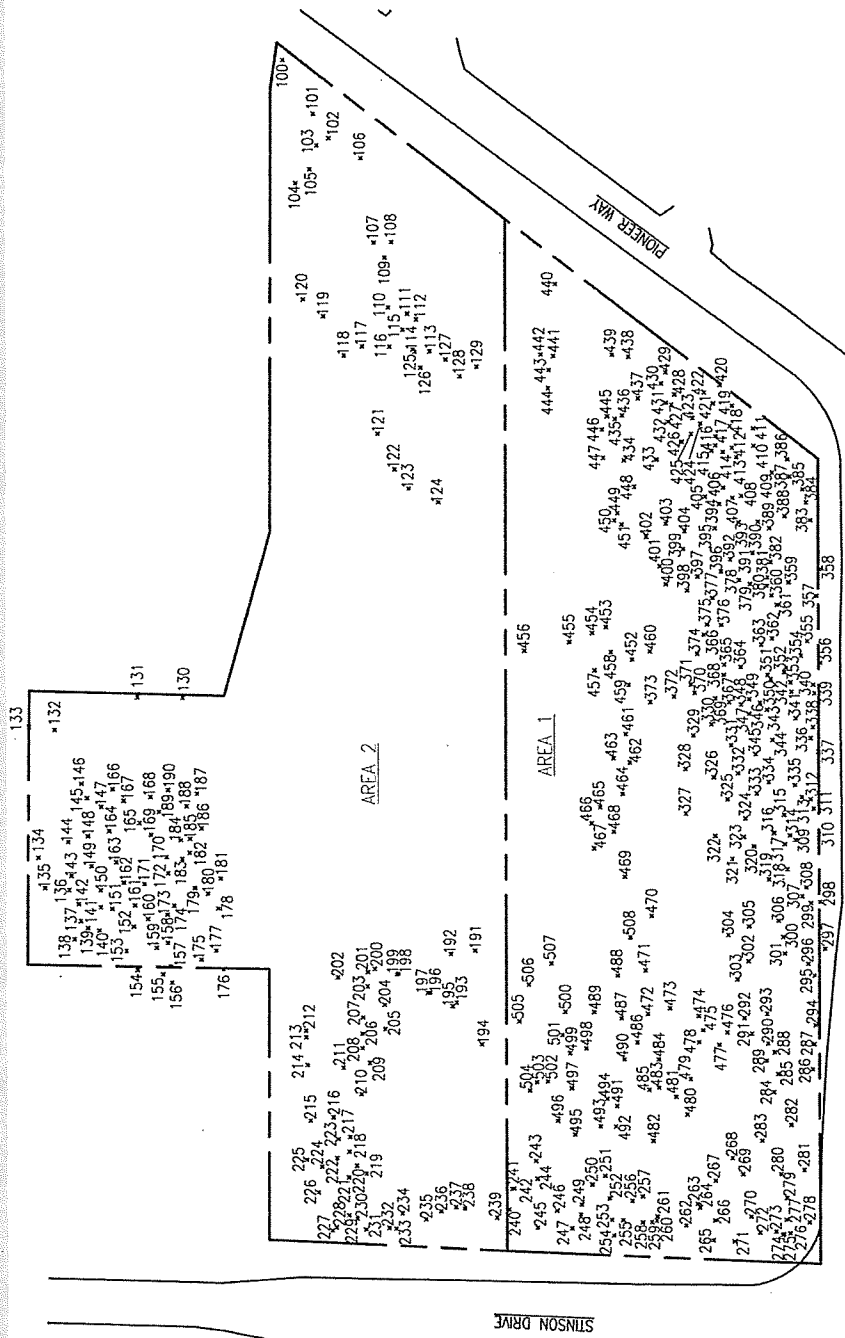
EXHIBIT C -- EXISTING SIGNIFICANT TREE PLAN
